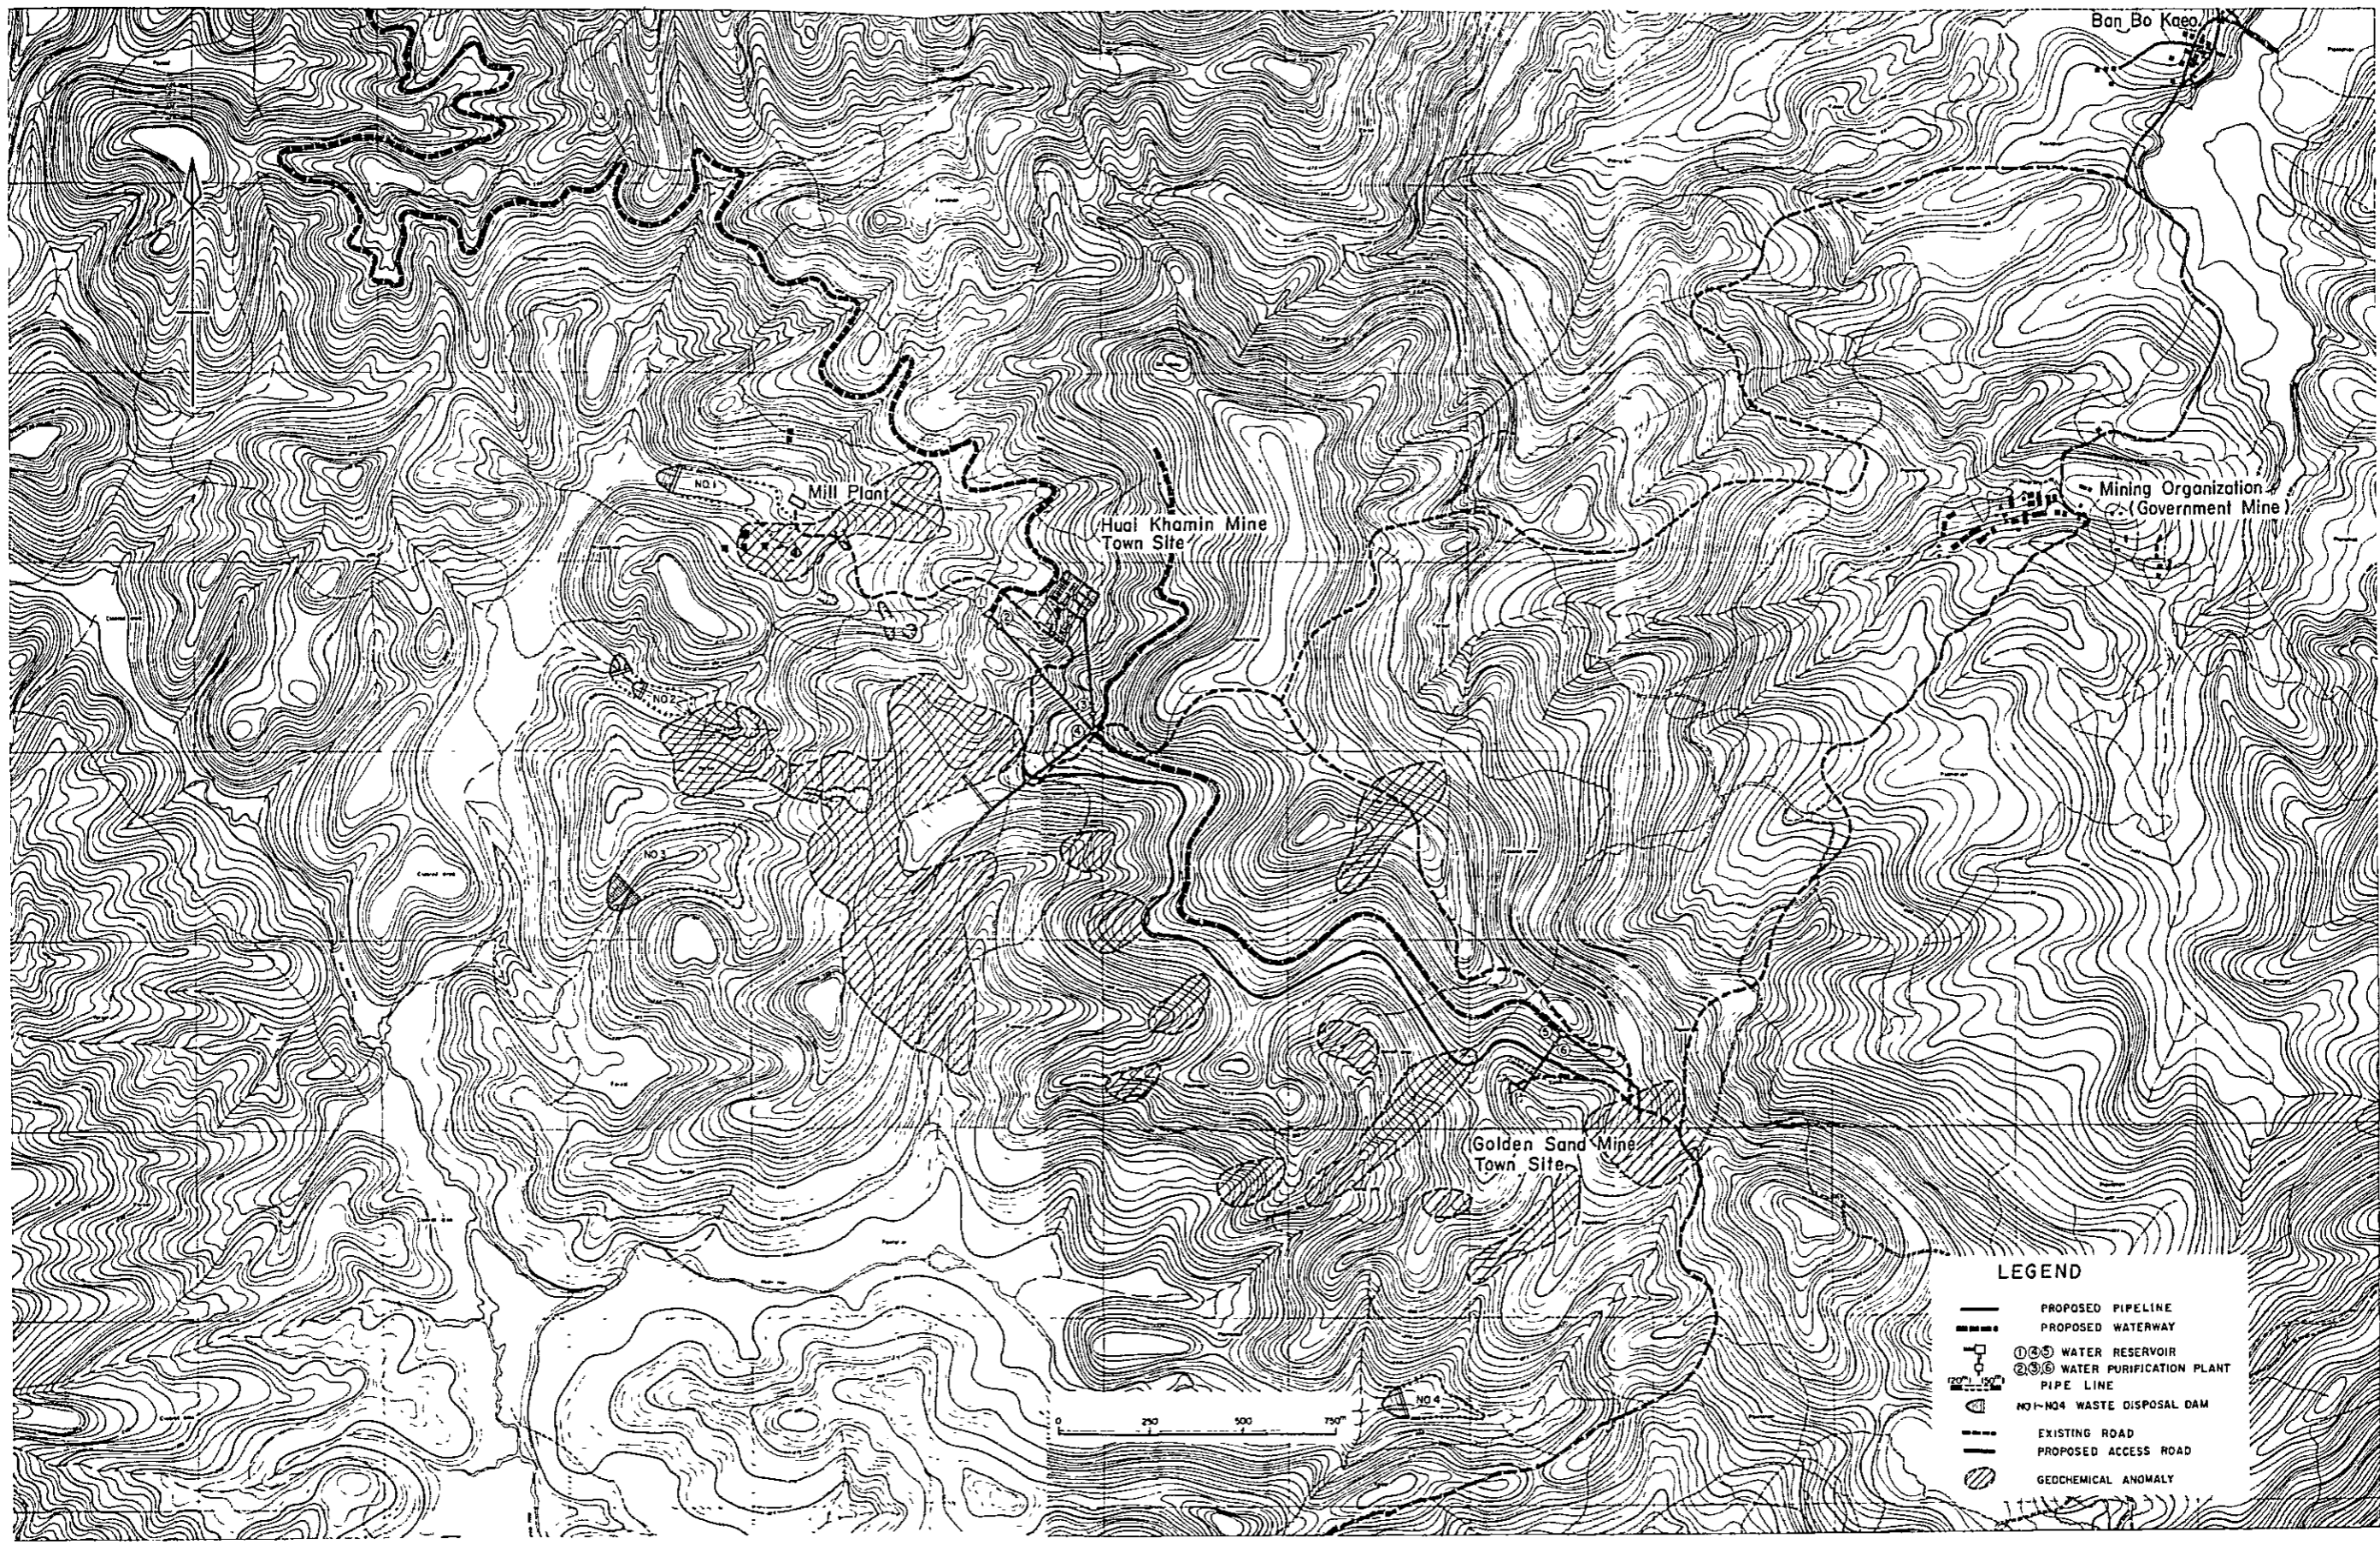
Proposed Mine Town, Waterway, Dam and Road
